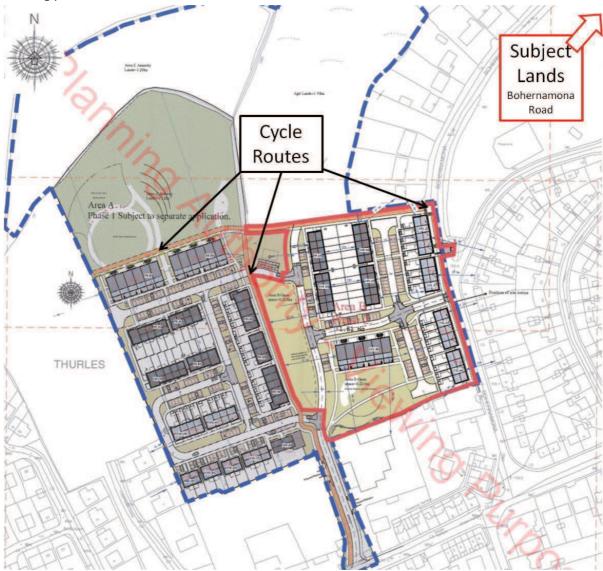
Permitted Site Layout Plan Reg. Ref. . . Extracted from Tipperary CoCo Planning Viewer
